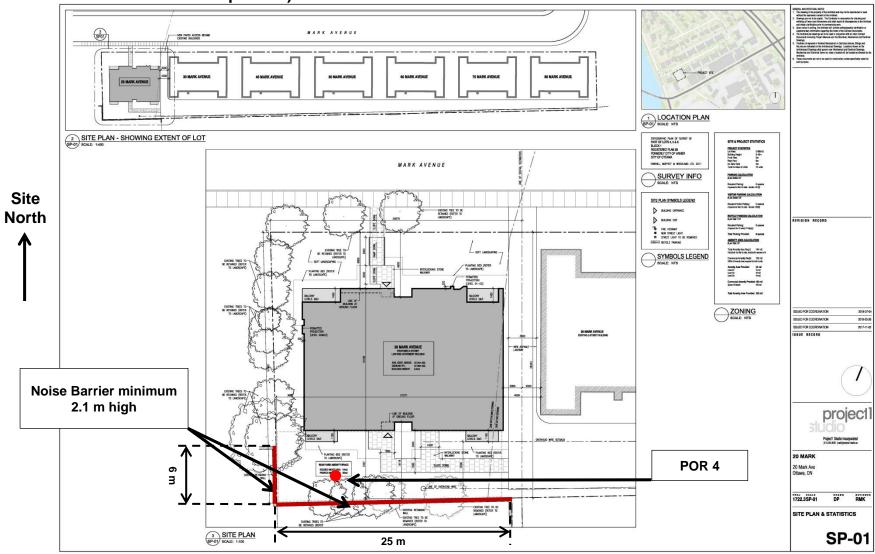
Site Plan showing Recommended Noise Barrier at POR 4 - Outdoor Living Area (source: Project1 Studio Incorporated)
